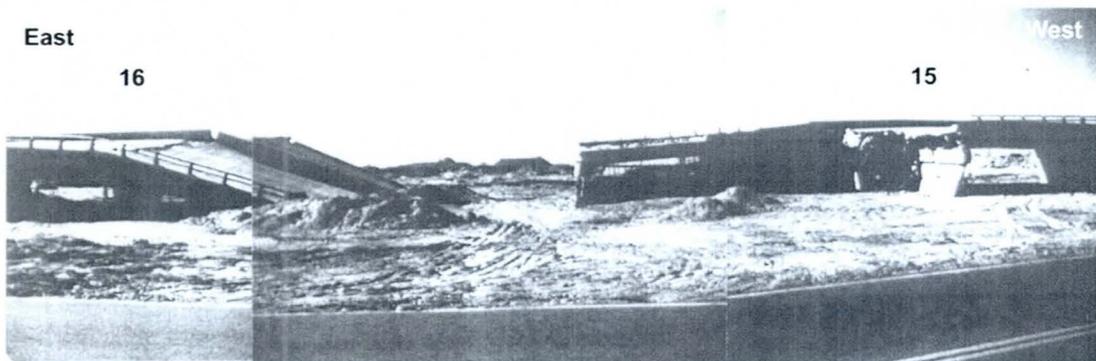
Photograph looking downstream (south) at failed bridge after February 26th.
